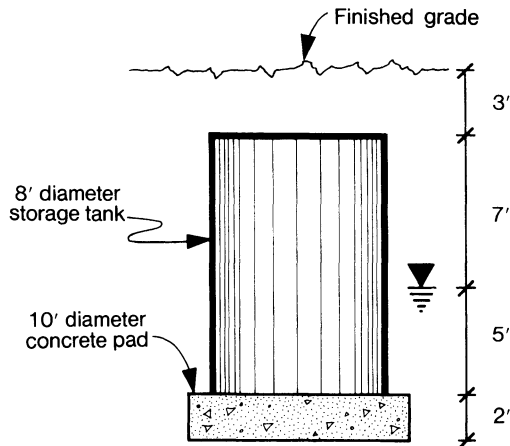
Example F-1—Underground storage tank subject to buoyancy.
